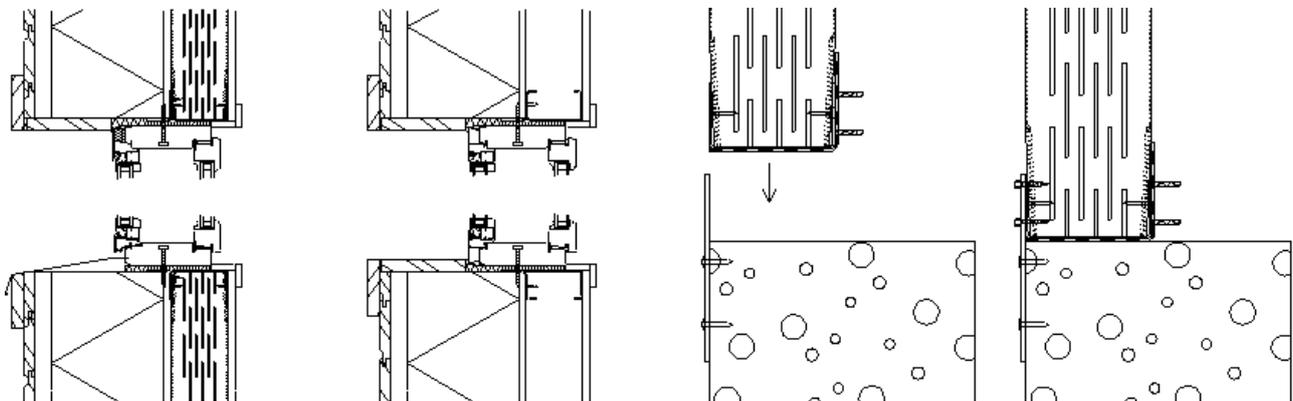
Two details from the work: Window detail (left) and Footing detail (right)
